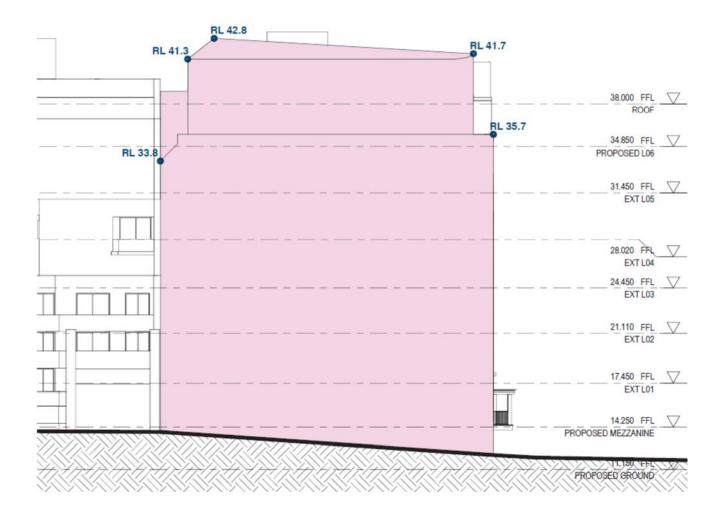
xx: Maximum building envelope southern elevation - Union Lane
